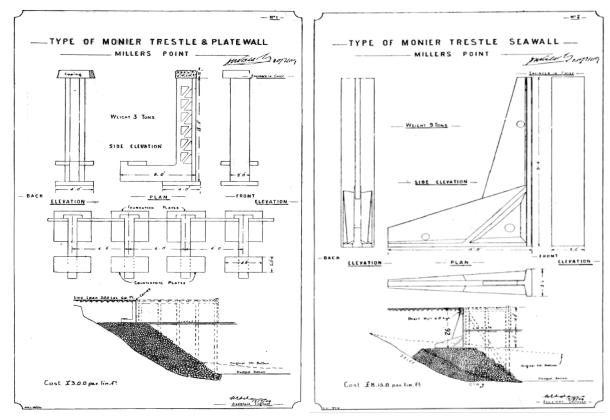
The two standard designs of Monier trestle and plate walls. 47
